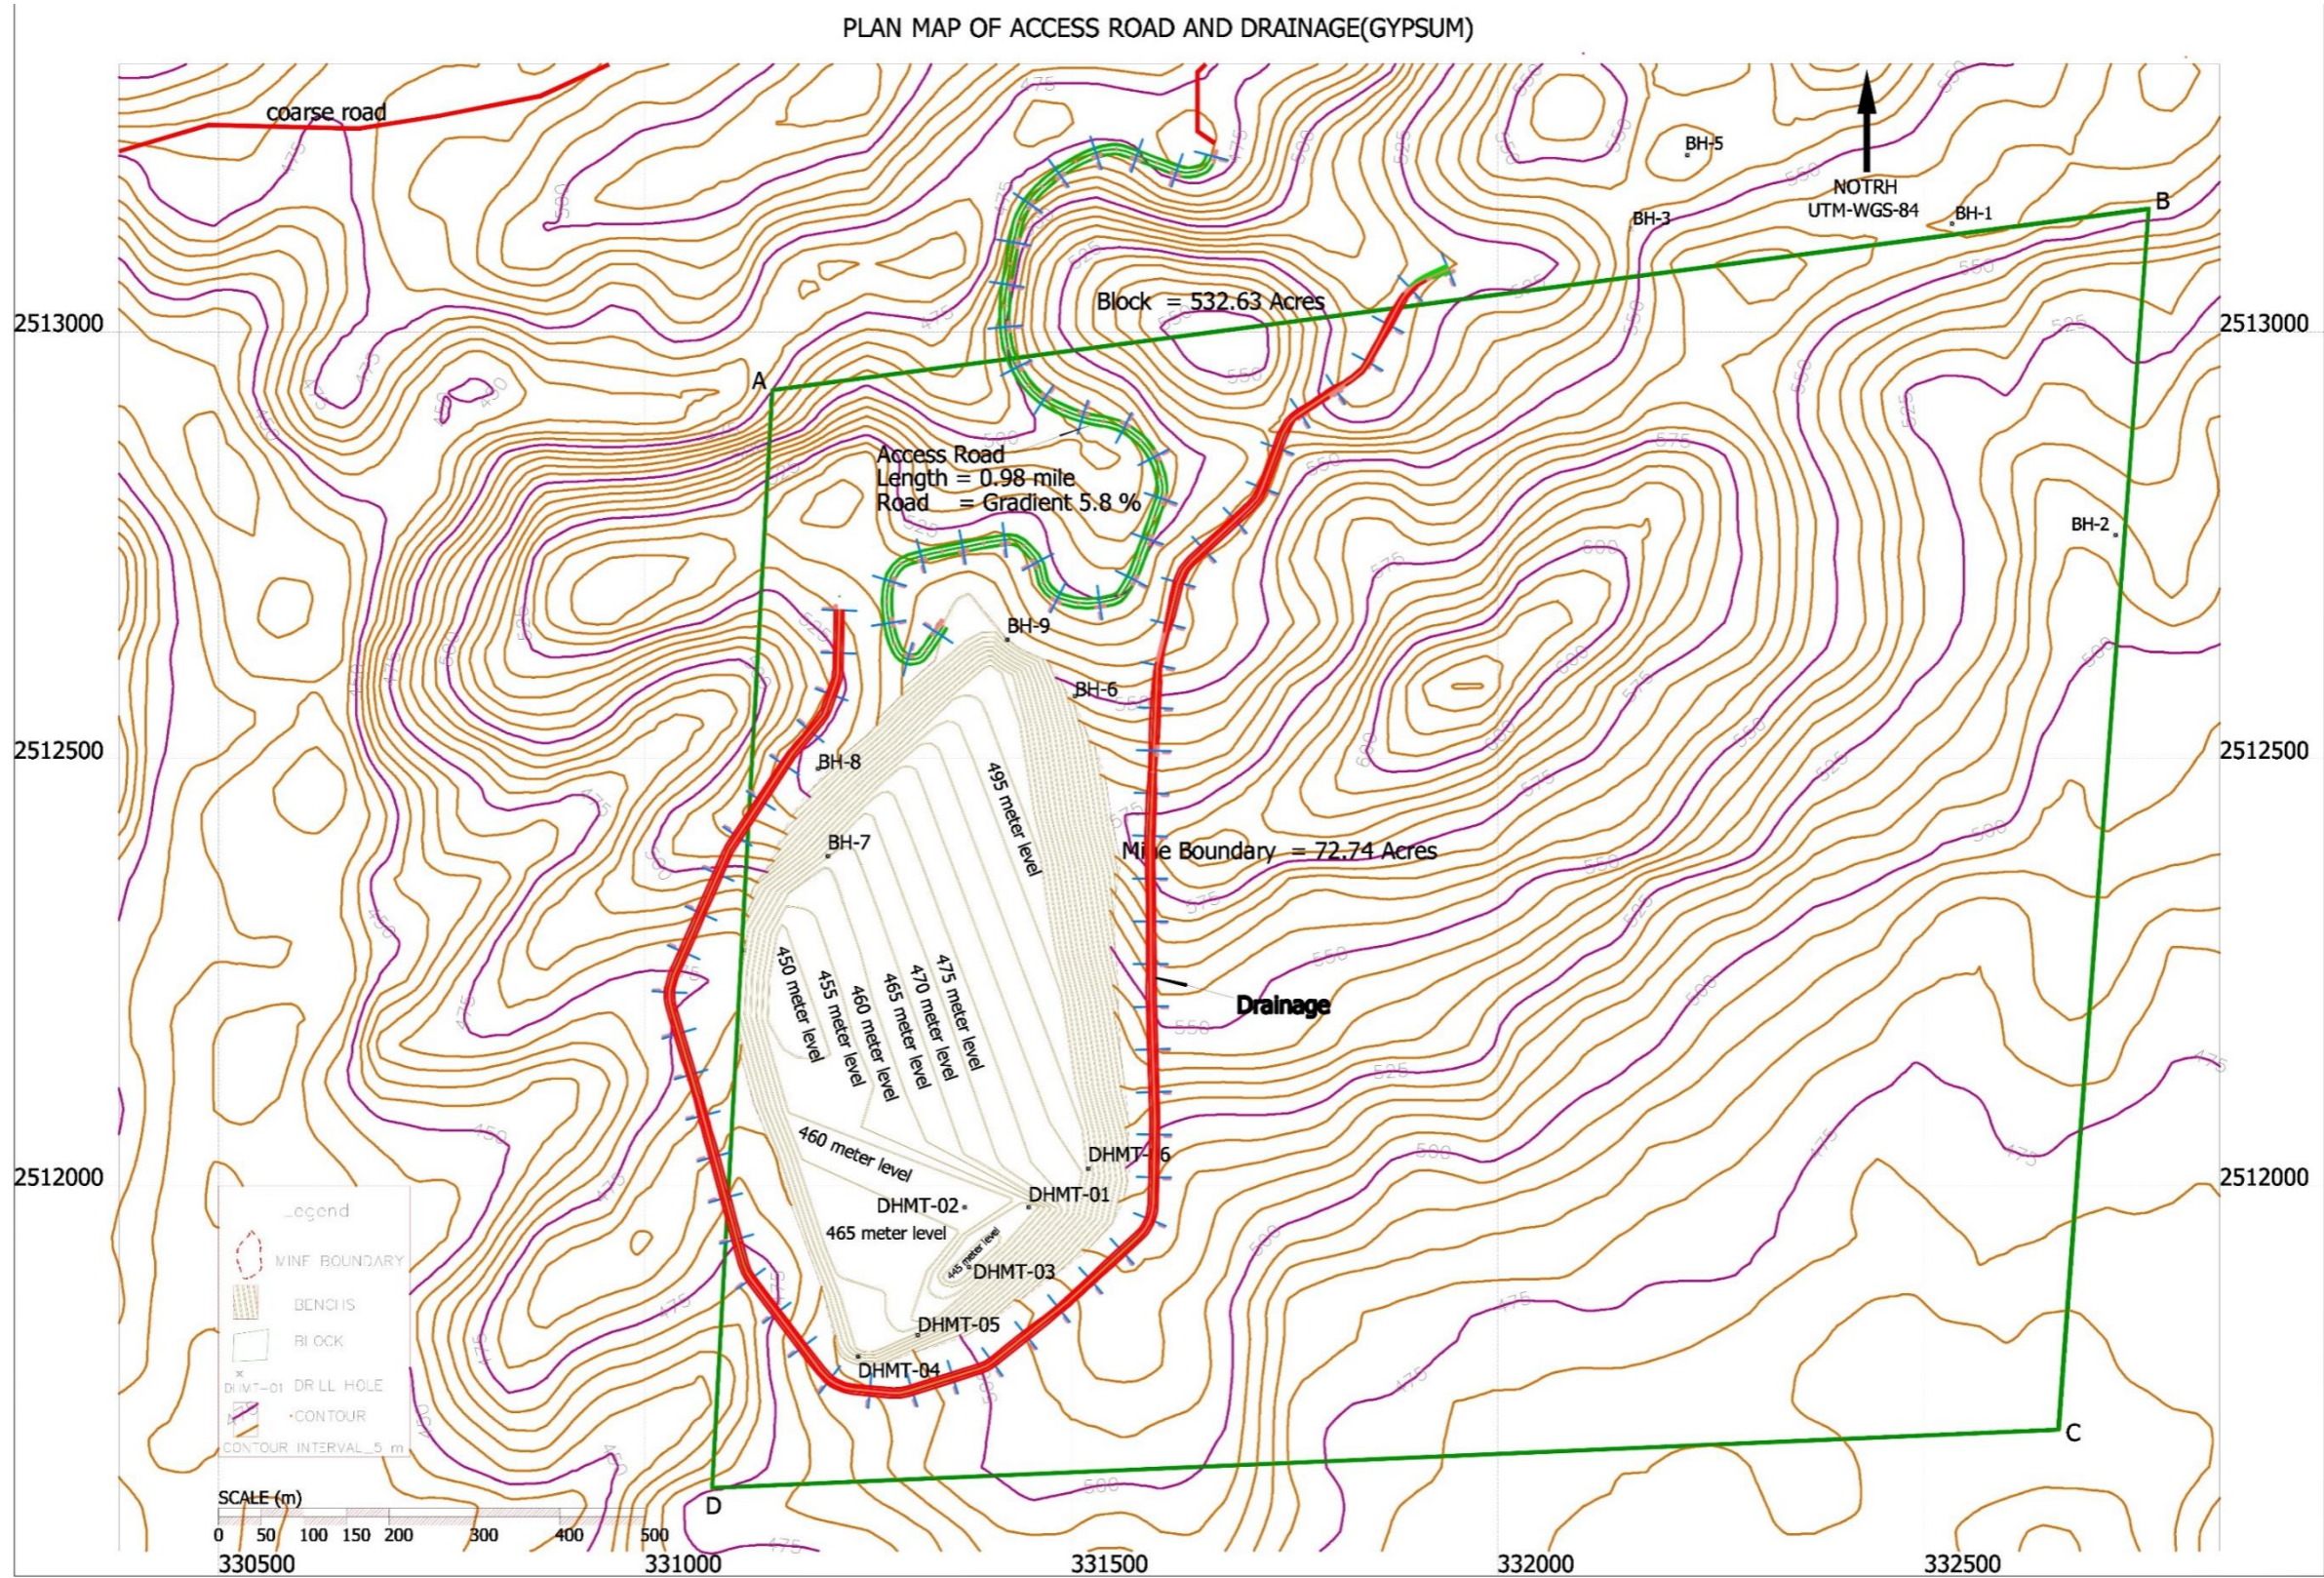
Plan Map of Access Road for Gypsum Mine
